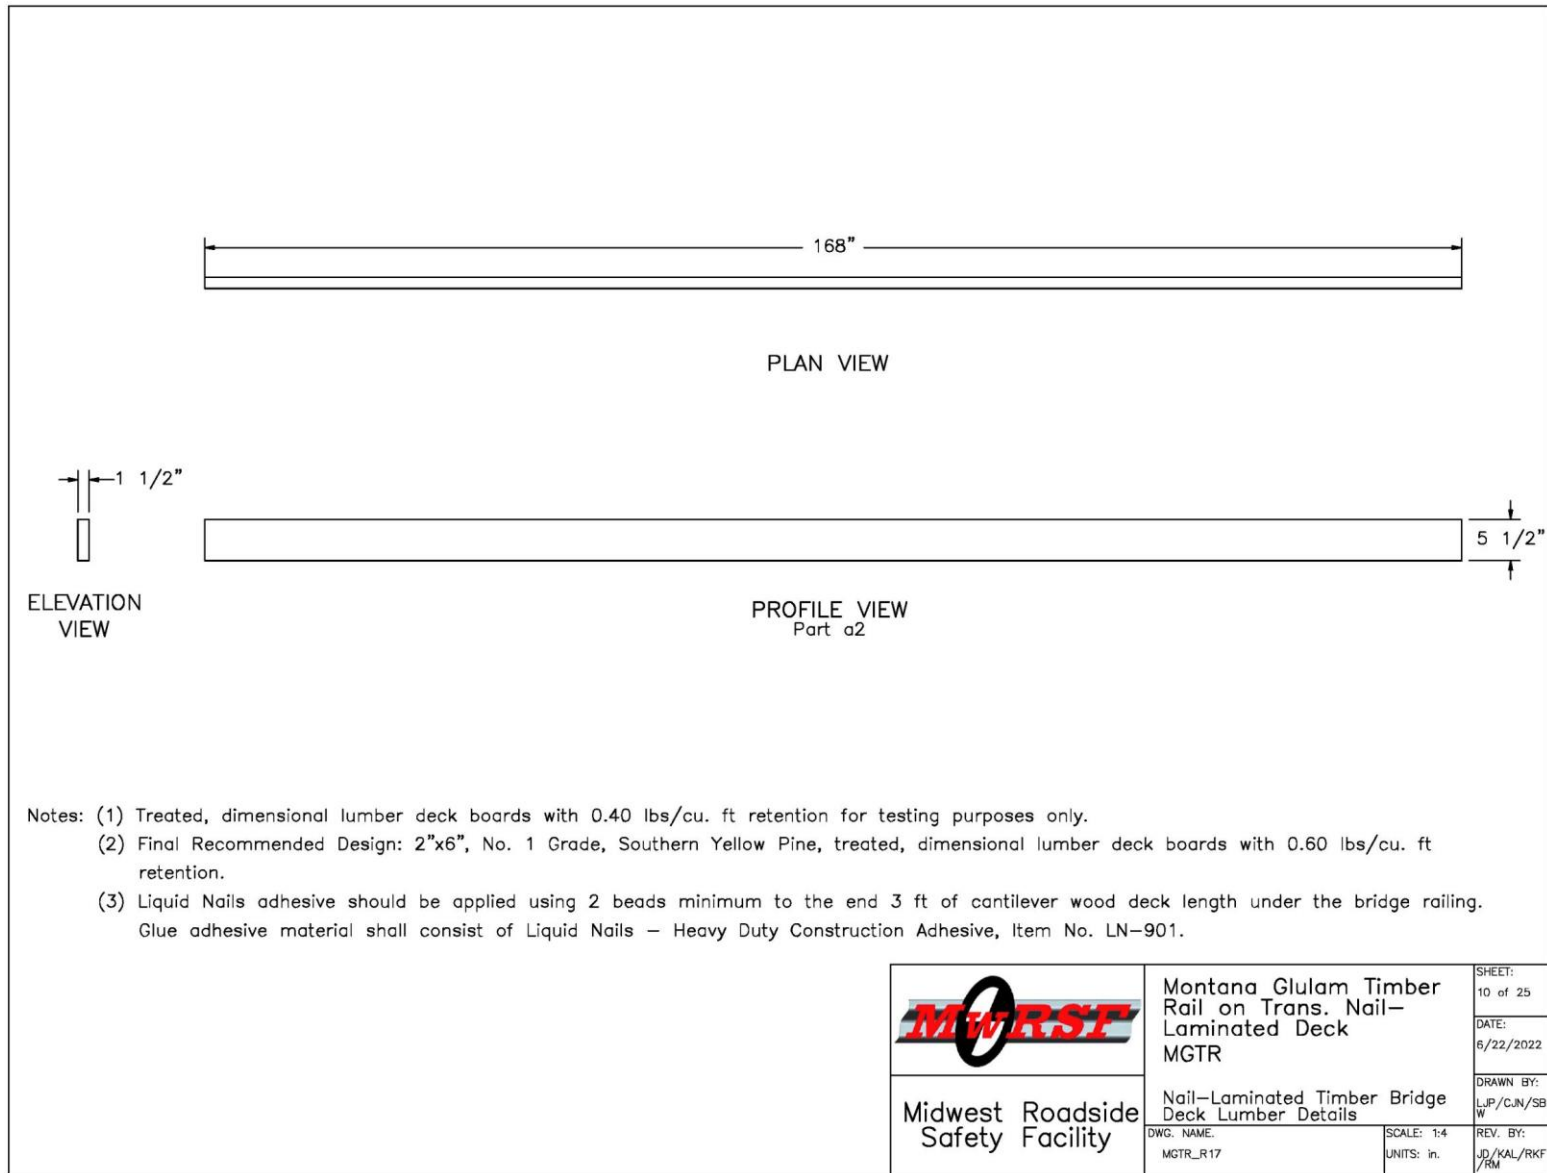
Nail-Laminated, Timber Bridge Deck Lumber Details, Test Nos. MGTR-1S and MGTR-1D
